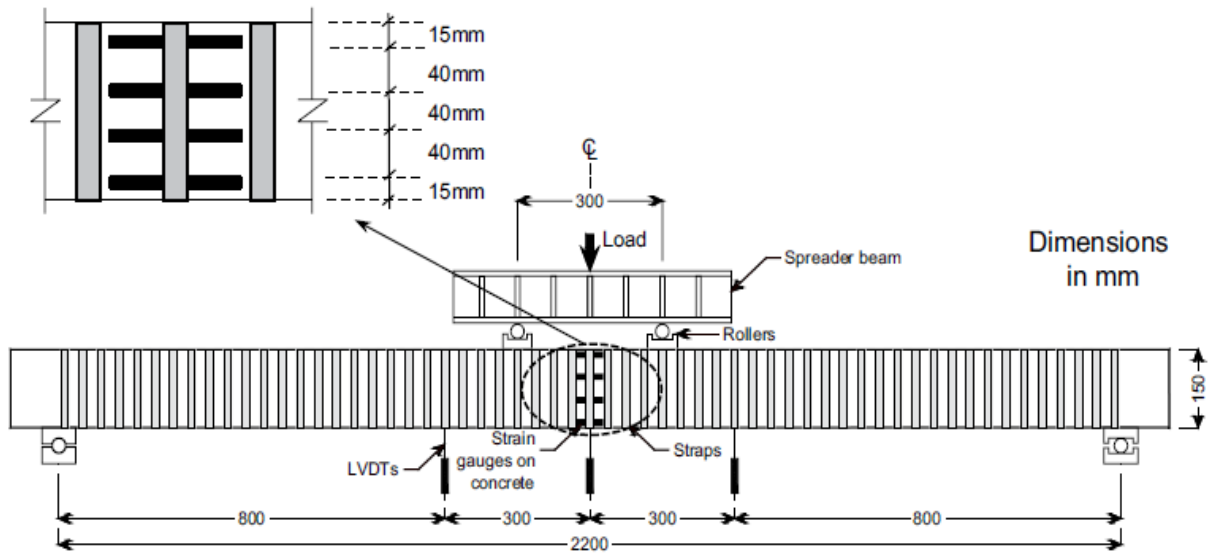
Beam details of the specimen used by Chau Ma et al. [15]
